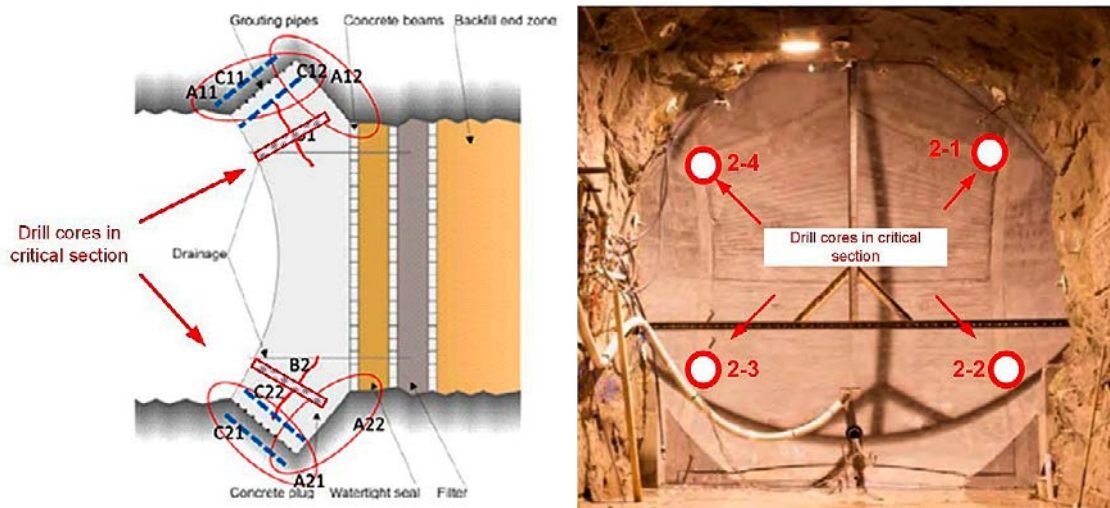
Drill cores with diameter 95 mm in the critical section (high tensile stresses).
